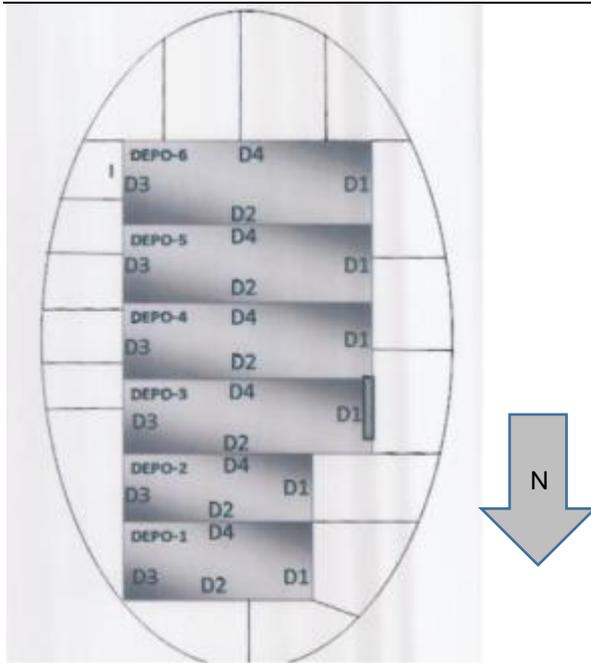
Sample location of wall and floor samples – MAM Tübitak report 2013 (North is to the bottom of the picture)
